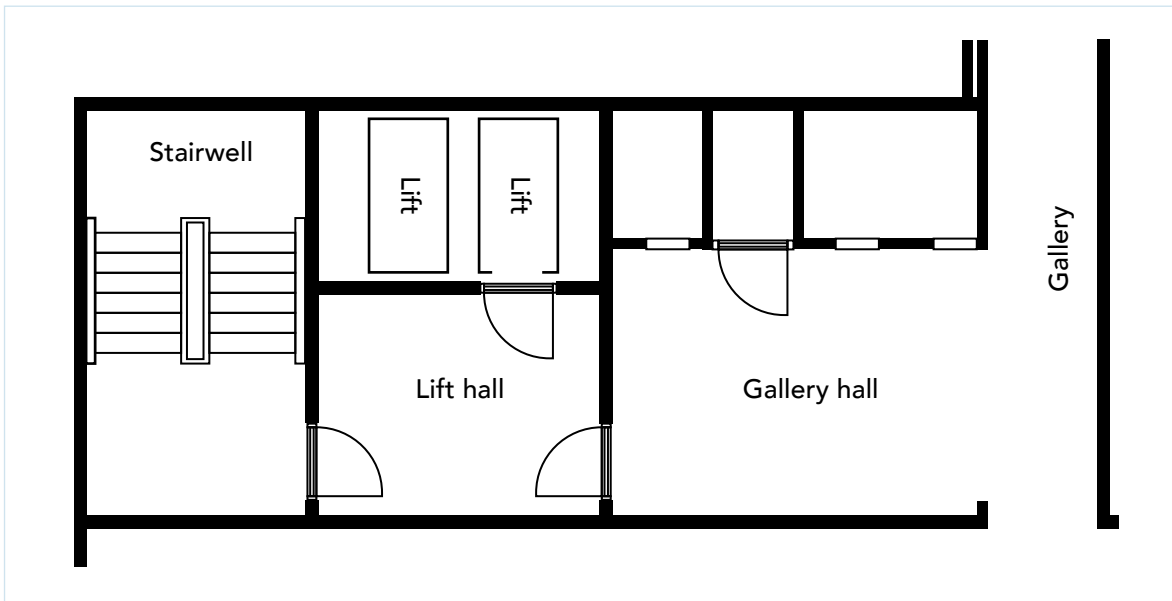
Schematic floor plan of the lift halls on the block of flats.
